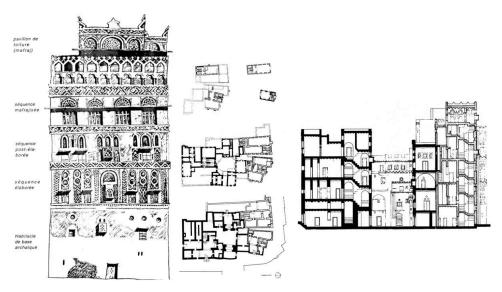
Typical Façade of Tower House (Left) and Cross-Section of Tower House Building (Right)
